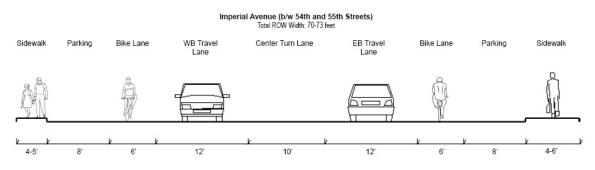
G: Barriers to Mobility – Imperial Avenue
